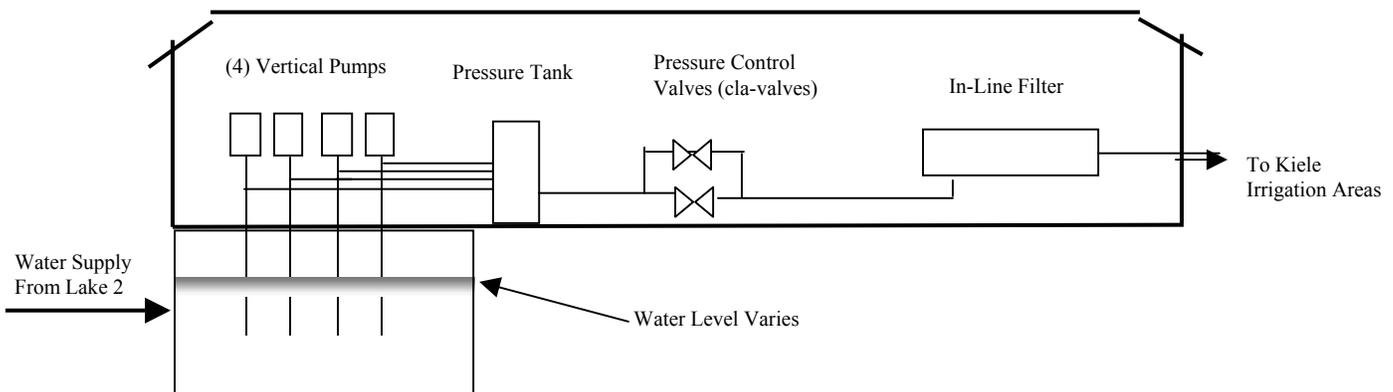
Pump System Piping Arrangement (Typical of 2)
